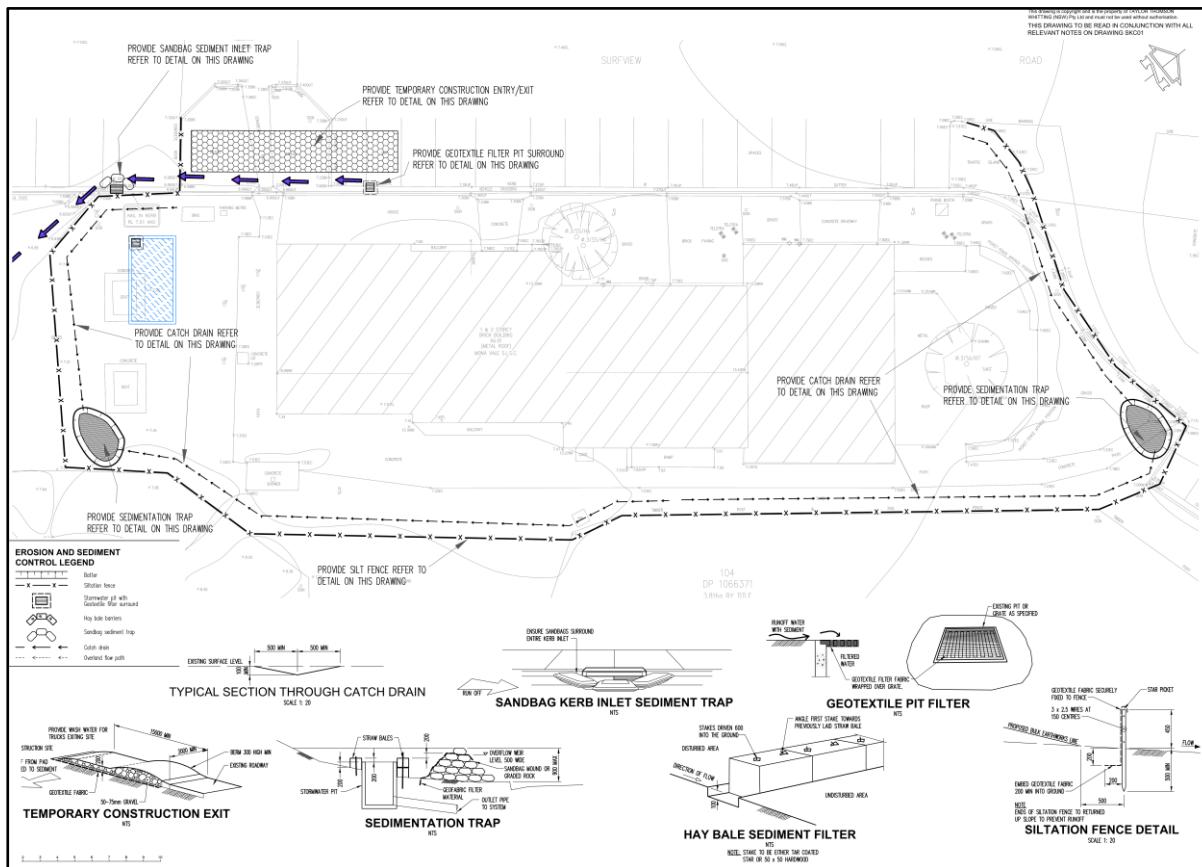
Extract of SKC102 Erosion and Sediment Control Plan
